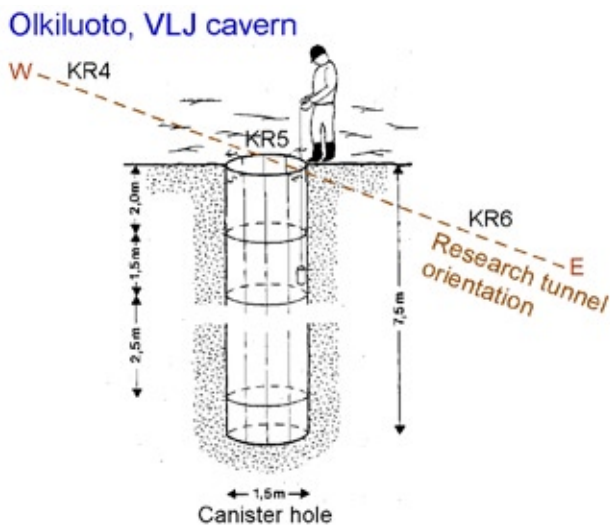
Radar measurements in VLJ tunnel floor and in full scale deposition hole.
